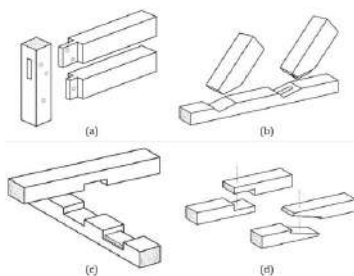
Examples of carpentry connections: (a) Through pinned mortise and tenon (a') Blind pinned mortise and tenon (b) Notched joint between main rafters and tie-beam (c) Half-lap joint (c') Cogged half-lap joint (d) Halved scarf-joint (d') Scarf-joint with under-squinted ends
